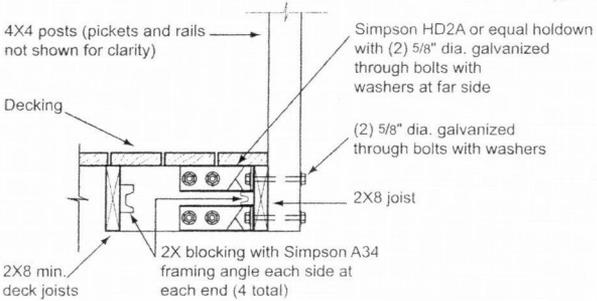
Guardrail attachment option 3 - Deck joists parallel, post on outside, manufactured connectors
